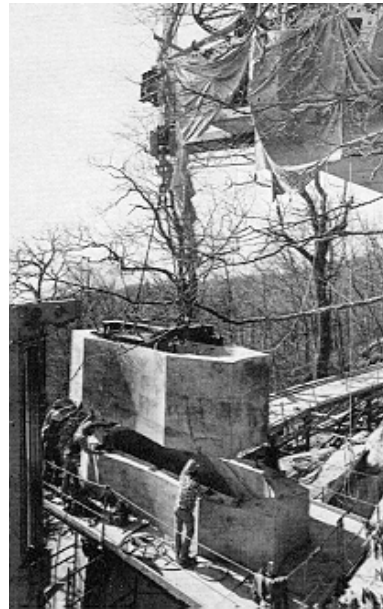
Precast hollow concrete pier segments lowered into position from the deck above at the Linn Cove Viaduct in North Carolina²⁹
